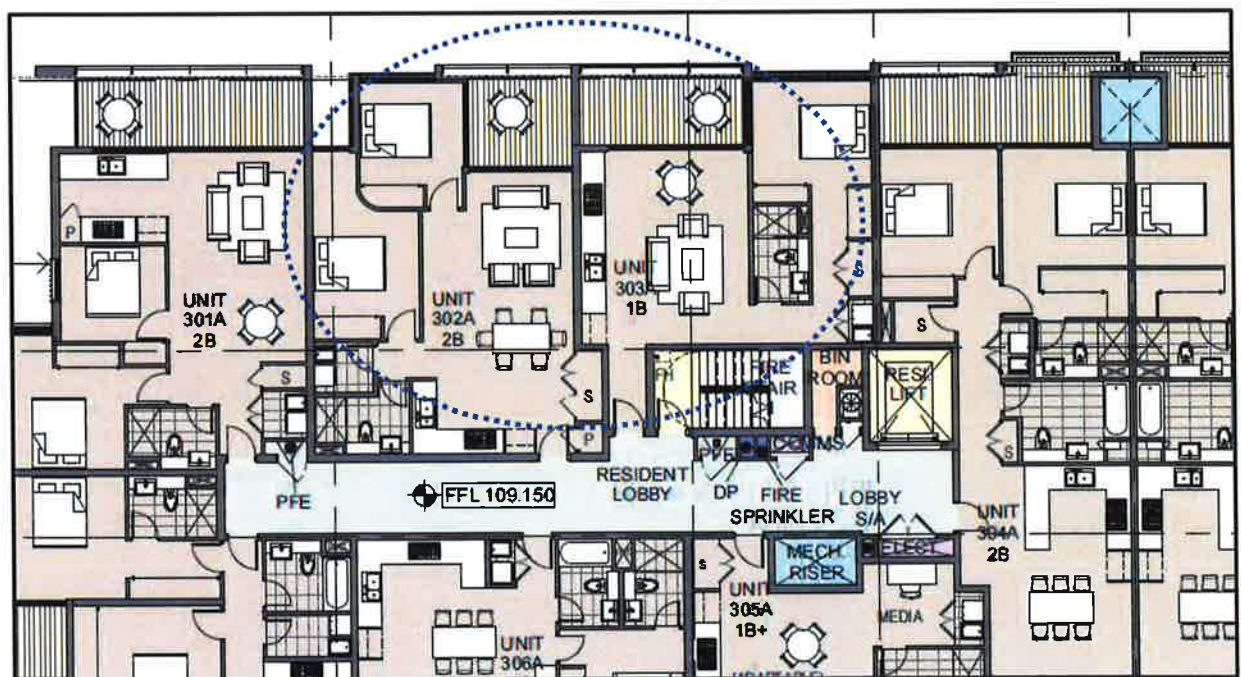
Approved floor plan showing subject apartments circled (Source: Applicant's submitted plans)
